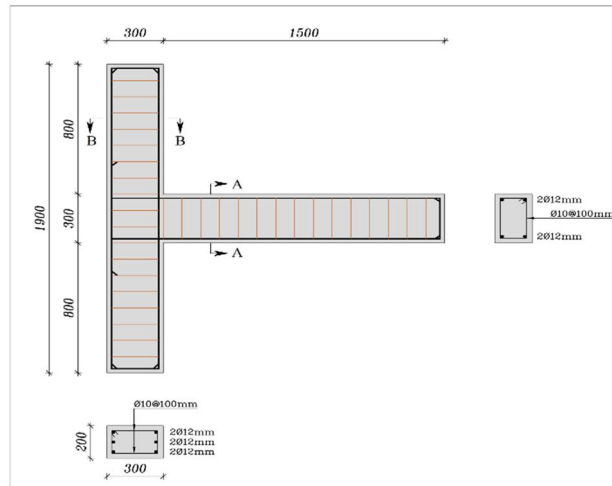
Geometry (in mm) and reinforcement detail of test specimens
